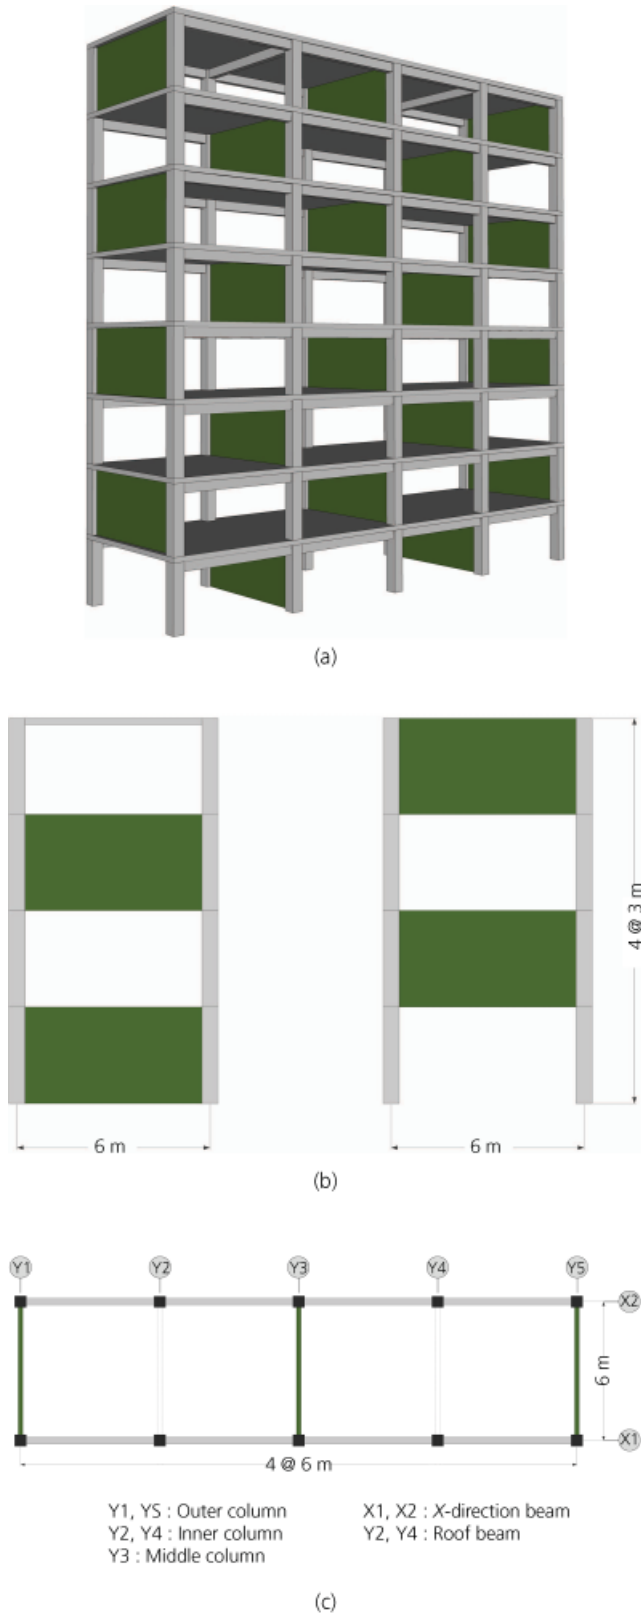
Configuration of the model structure with 6 m staggered walls: (a) 3D view of a staggered wall-beam system; (b) elevation view (c) structural plan
